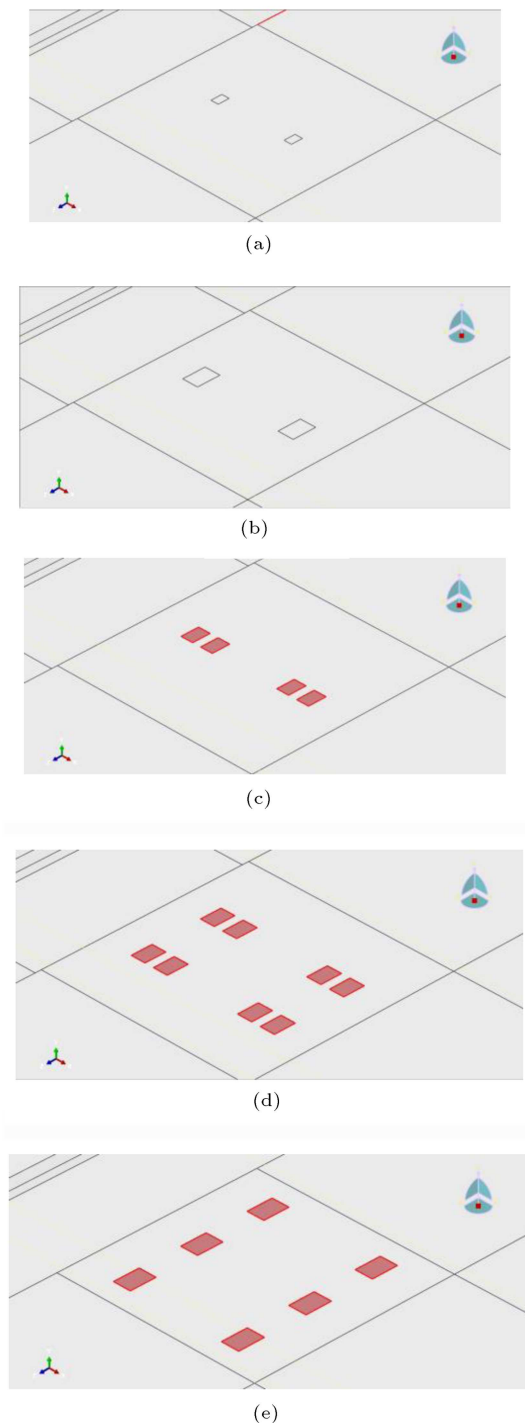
Shape of modeled loads: (a) Single axle, 4 tons, (b) single axle, 8.2 tons, (c) single axle, 13 tons, (d) tandem, 22 tons and (e) tridem, 26 tons.
